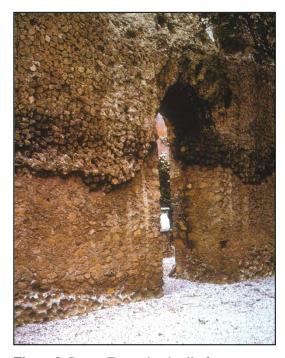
Rome, Testaccio: detail of concrete building with *opus incertum* facing.
